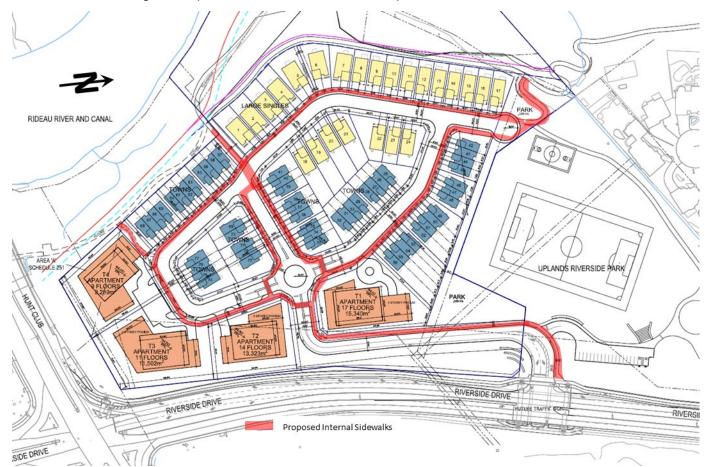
Proposed Sidewalk Connections and Active Transportation Routes to Transit
